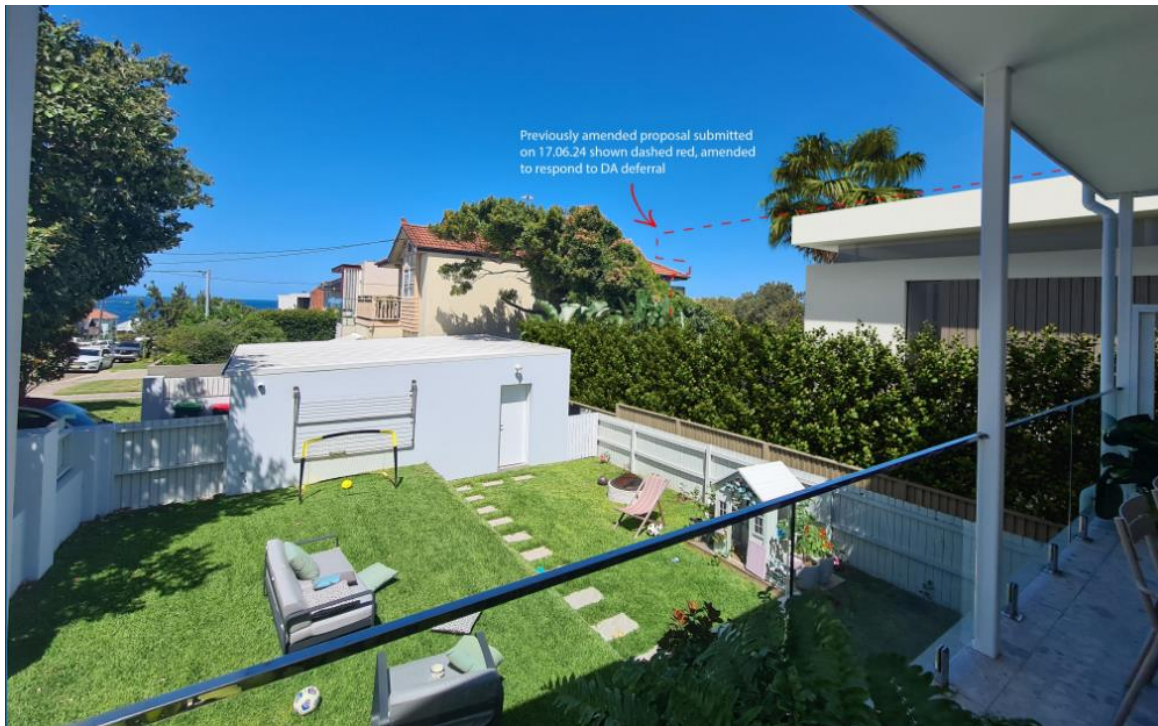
View from rear ground floor balcony of 1 Bona Vista Avenue - Render demonstrating how the proposal will look with mature landscaping (Source: Applicant)
